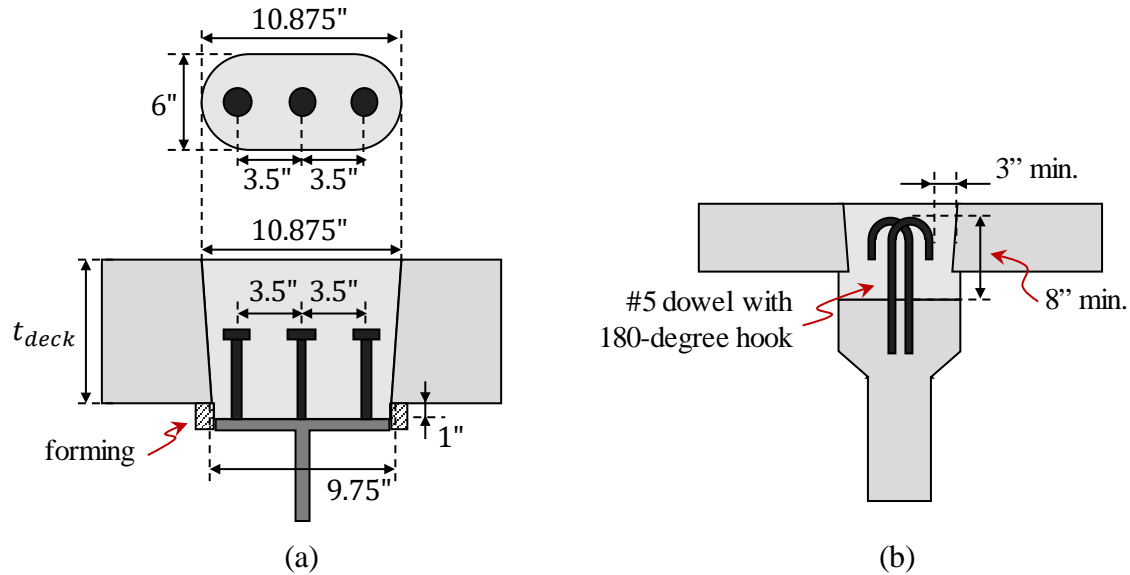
(a) Recommended detail for connection with precast barriers and (b) inclined breakout required in deck element [36]
